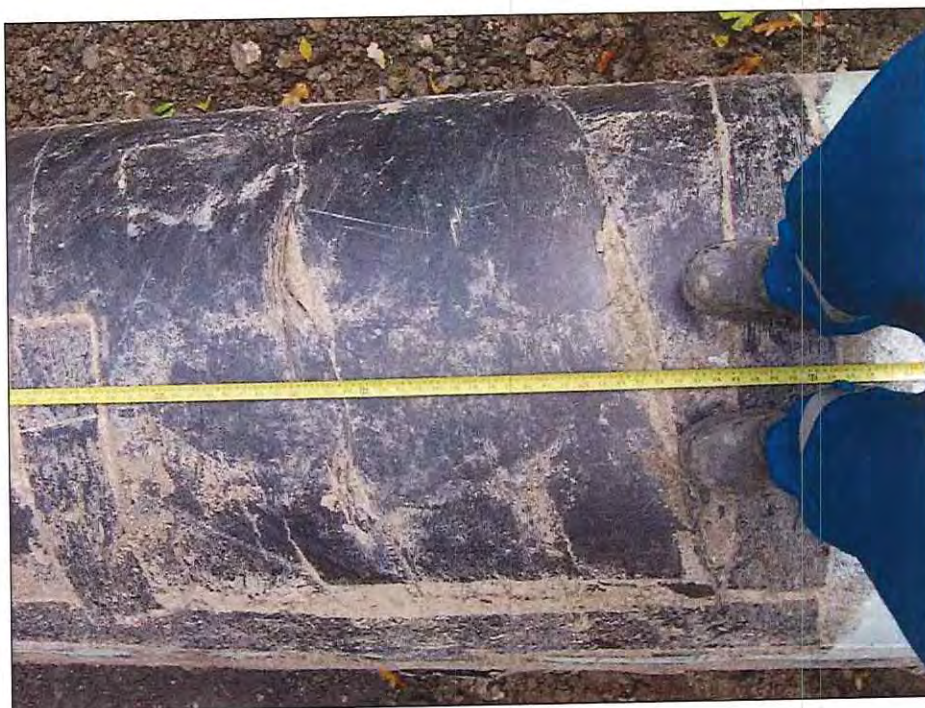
• Site 1. Sample of Coating Damage. Ch. 69.45 (6.40m).
